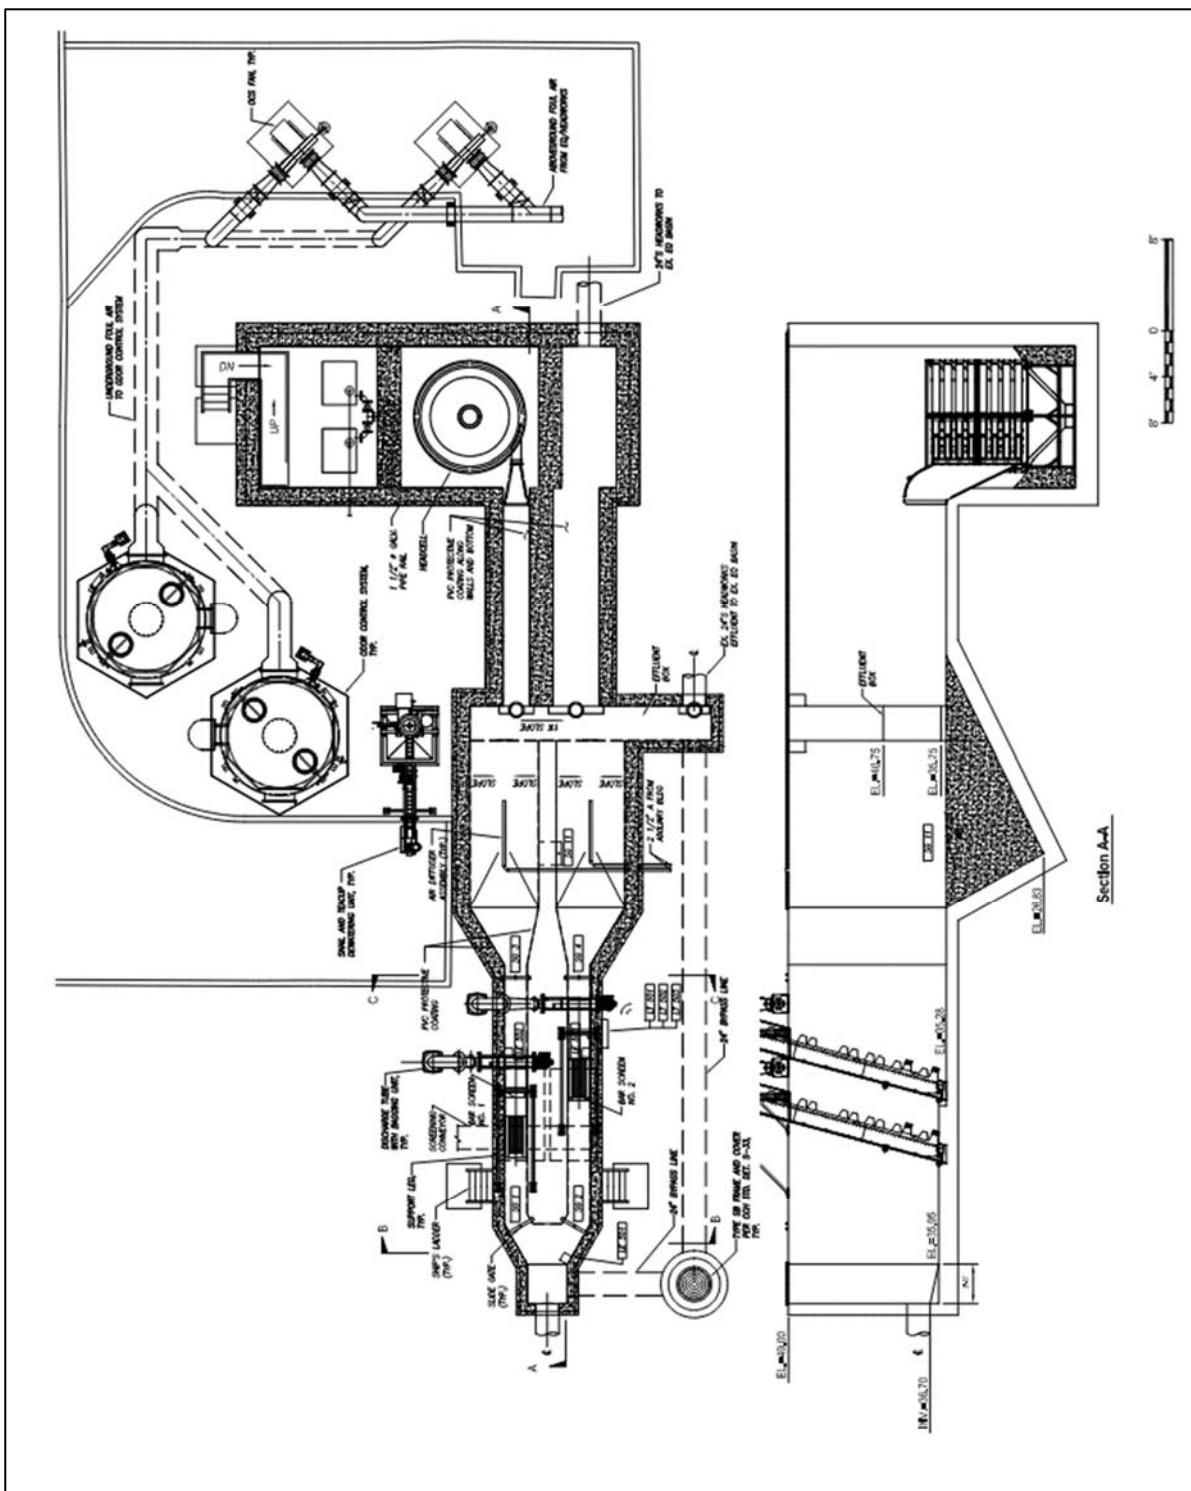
Headworks Proposed System – Plan and Section View
